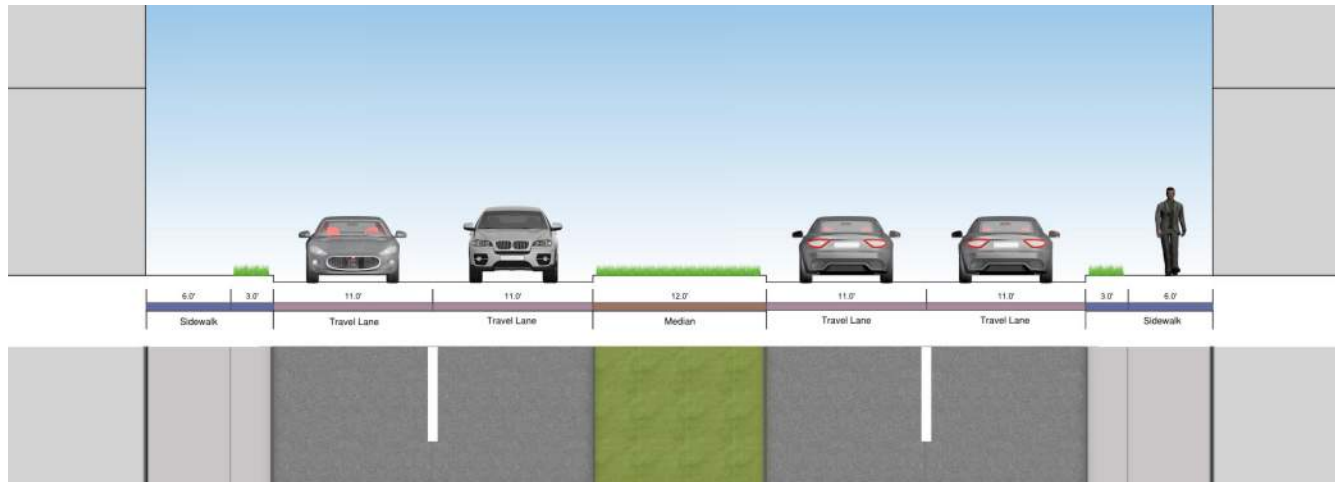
Woolford Road/Central Avenue Cross-Section B (68')
